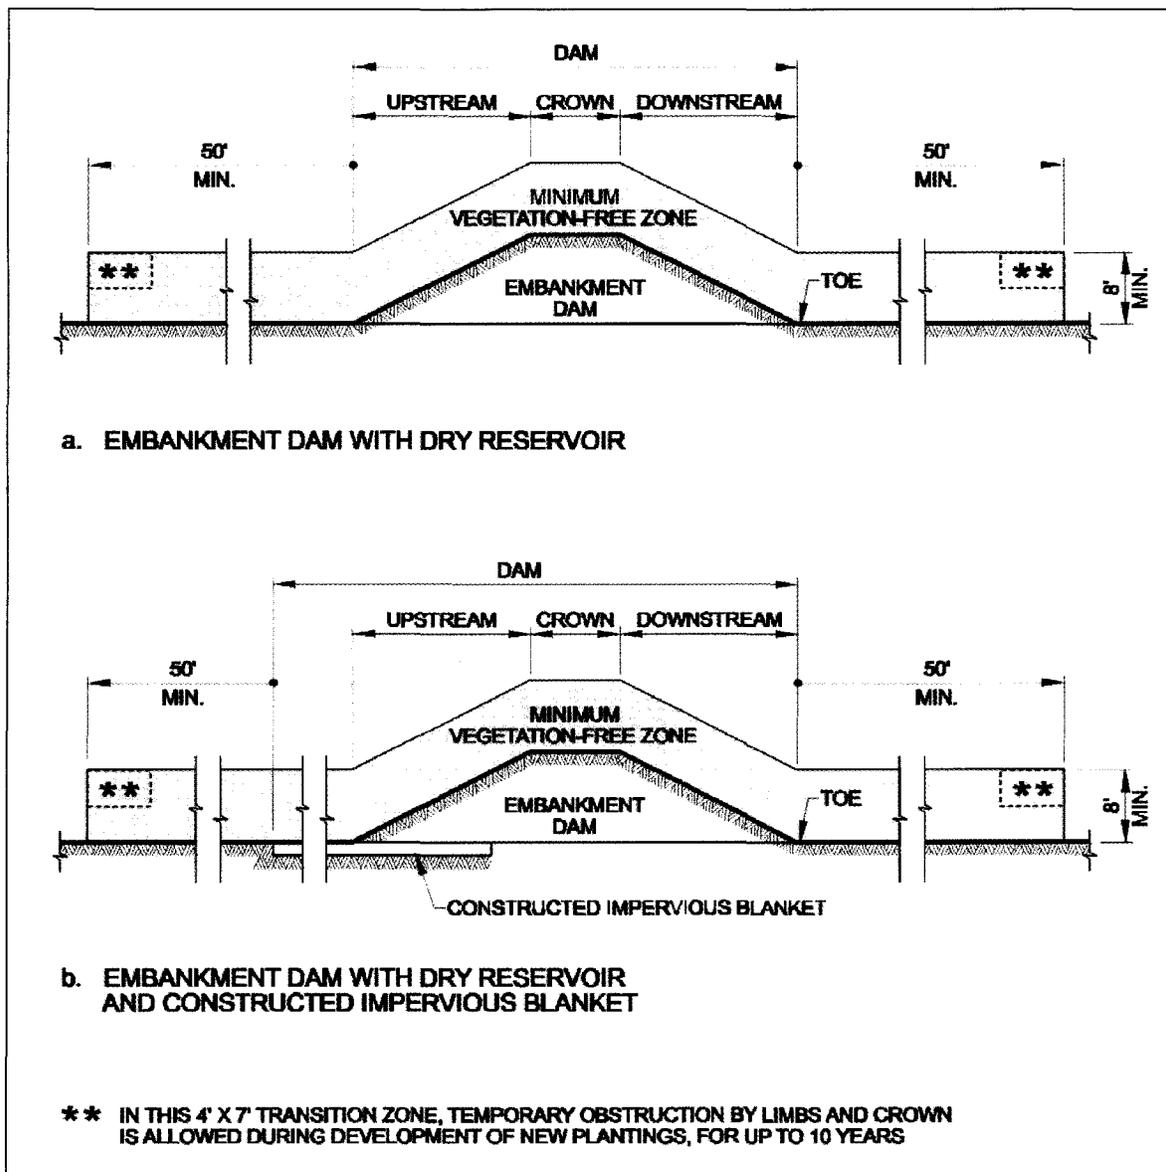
Embankment Dam (Earth Fill, Rock Fill, or Earth and Rock Fill).
